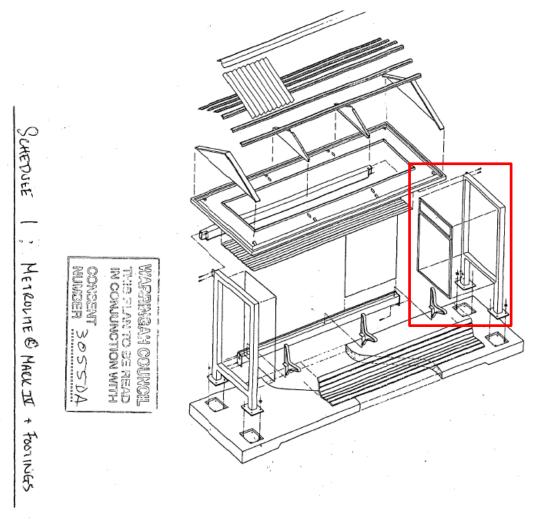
Shelter H4 DA3055 Stamped Site Plan
